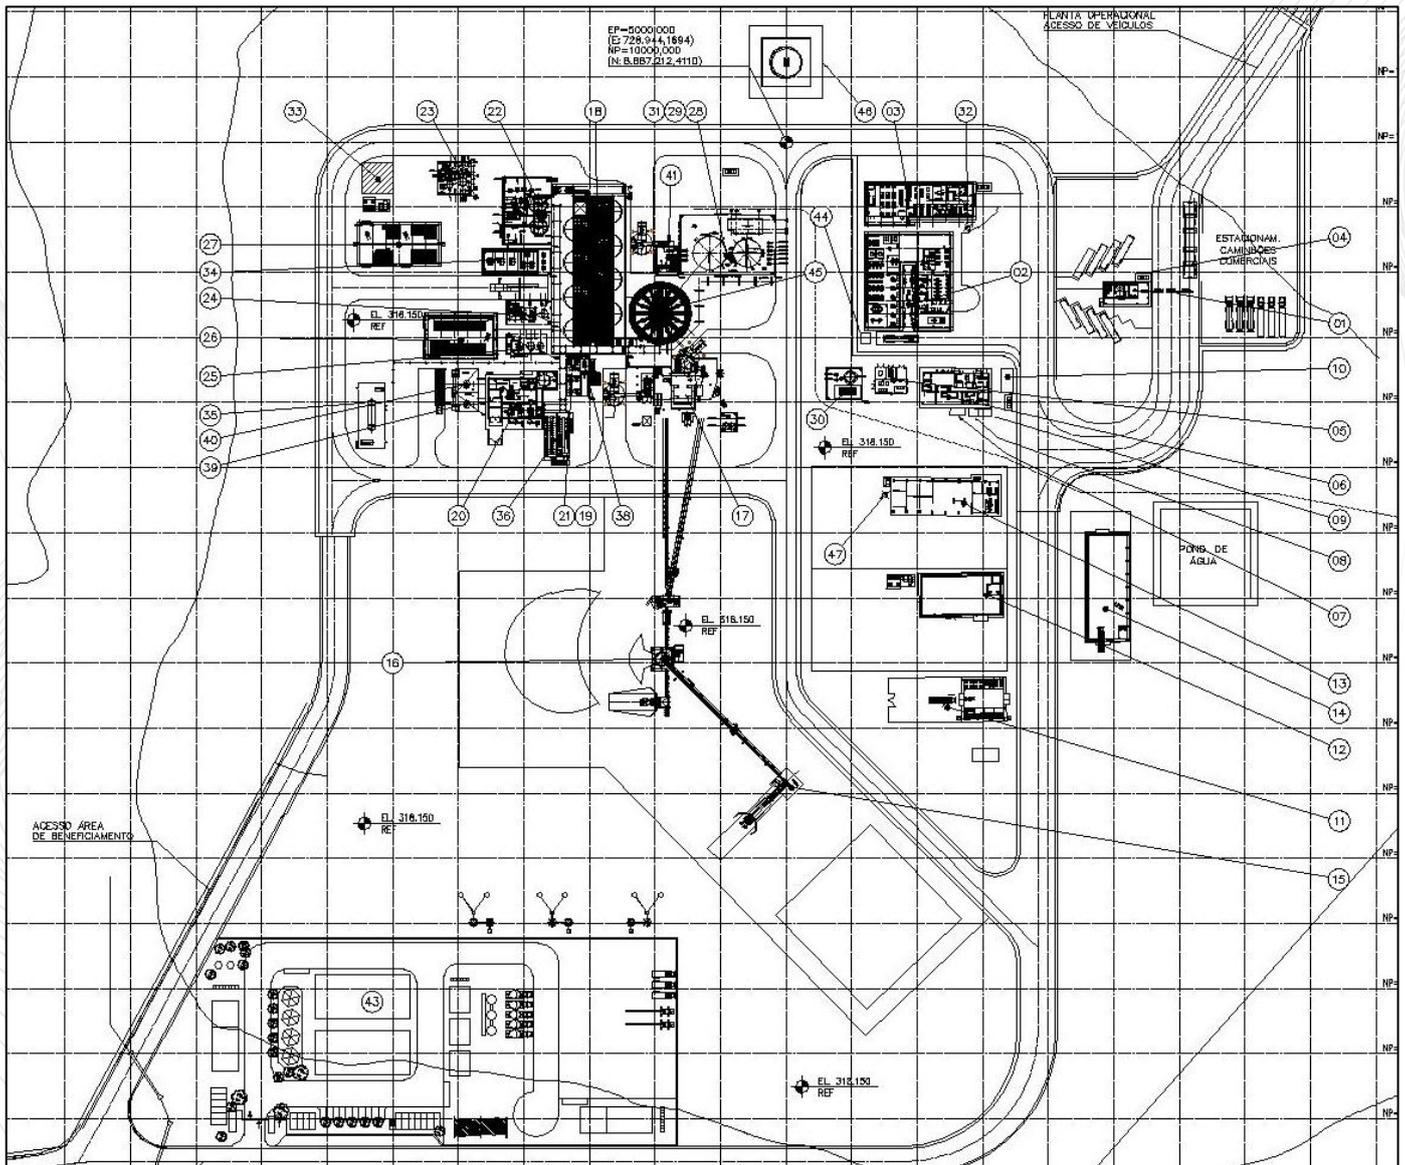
Overall Site Plan (MTP-B-DS-0000-P-0002-RB).
